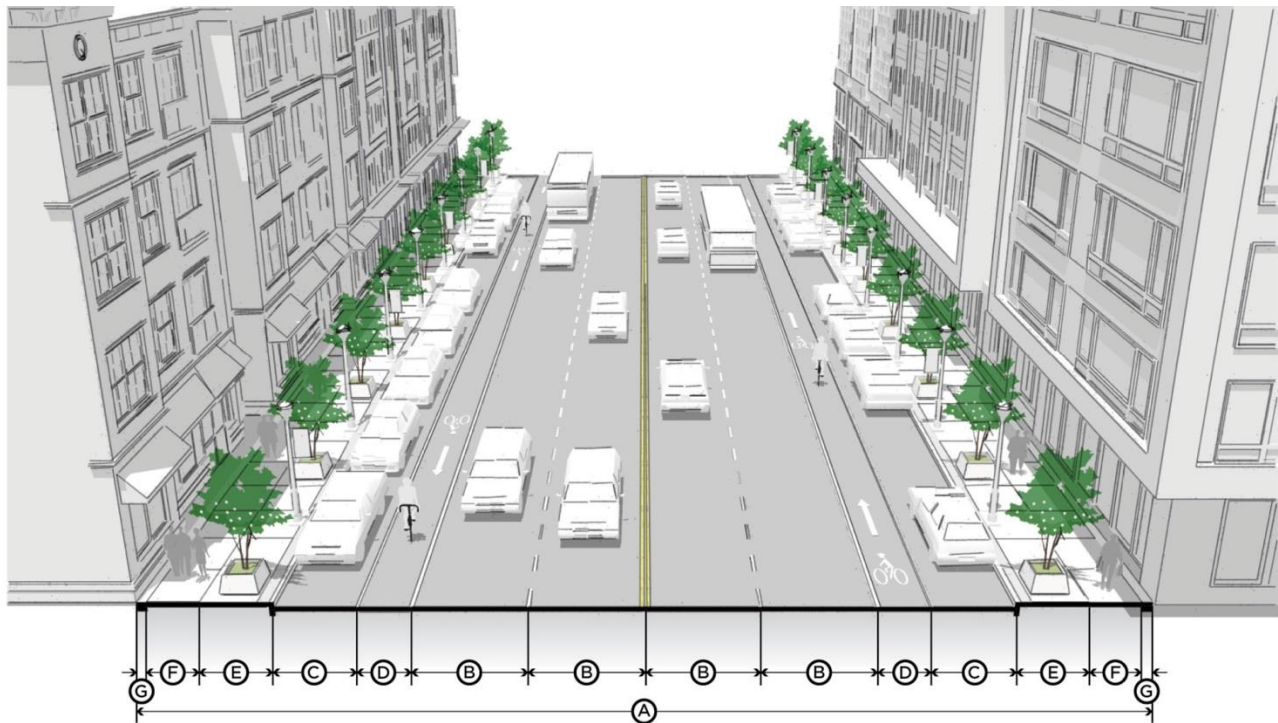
COLLECTOR: FOUR-LANE DIVIDED
